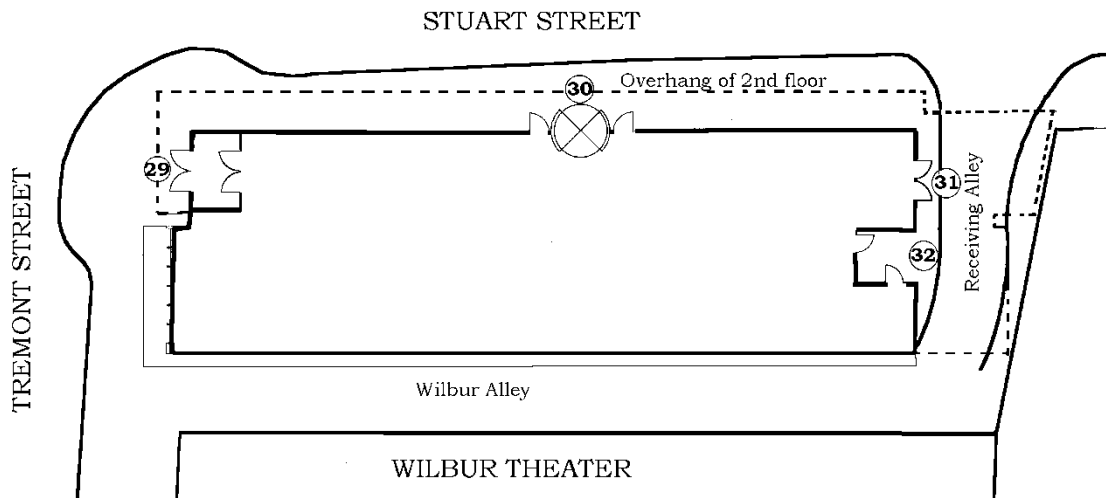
First Floor of NPC Building Indicating Entrances and Pedestrian Level Wind Study Locations and Numbers
